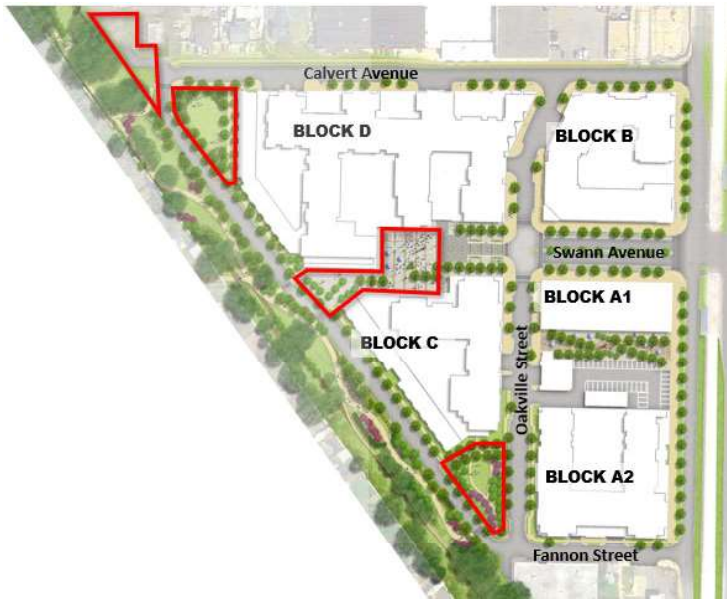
On-site Publicly Accessible Open Space (red outline) in previously approved Oakville Triangle CDD Concept Plan
